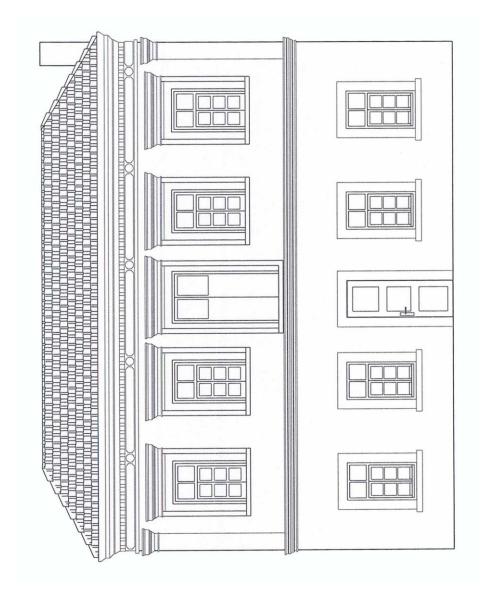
Front Elevation of 11-Hamam Street Scale: 1/75
